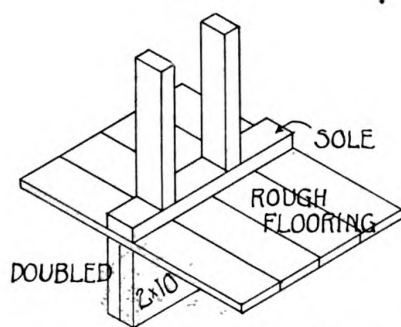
Incorrect construction of partition running parallel with joists. No nailing base is provided for finished floor, and joists must be dangerously cut if pipes are carried up in the partition.
